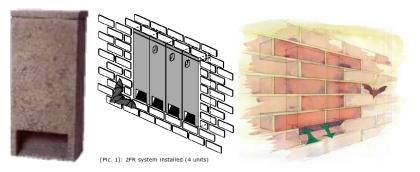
Bat tubes incorporated into the wall of a building to provide roosting space
